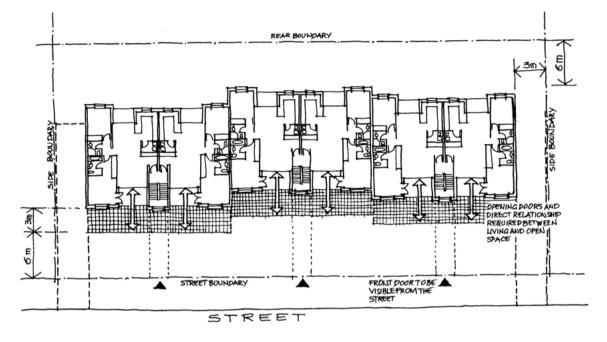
Plan - residential flat building development.
